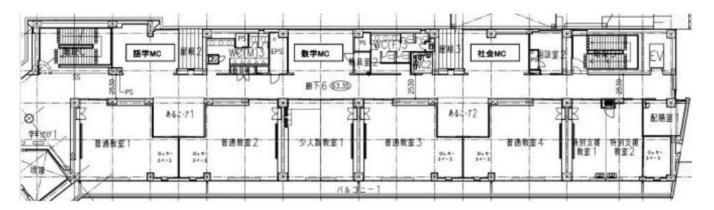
Subject media corner (MC) around a regular classroom (floor plan: courtesy of Ishimoto Architects Osaka Office)
